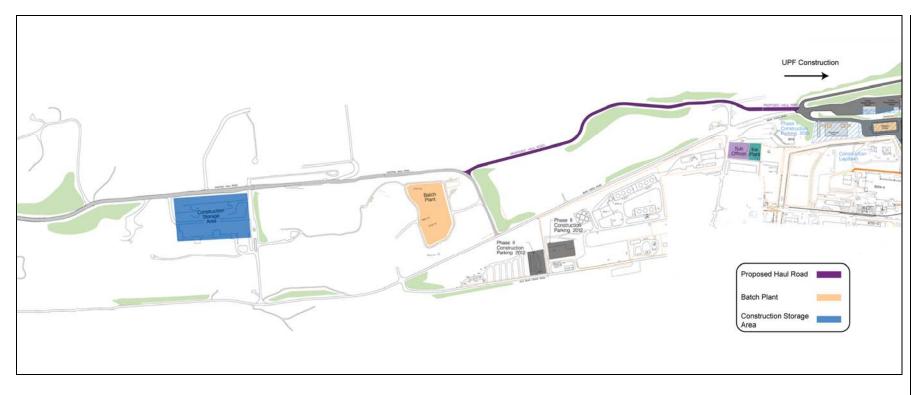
Temporary Haul Road, Batch Plant, Storage Area, and Temporary Parking for UPF Construction.
